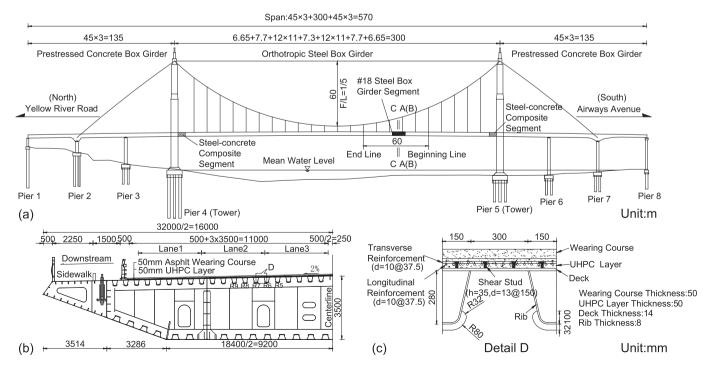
Overview of the Fengxi Bridge: (a) elevation view; (b) half-cross-section of the steel box girder; (c) details of the lightweight composite deck.
